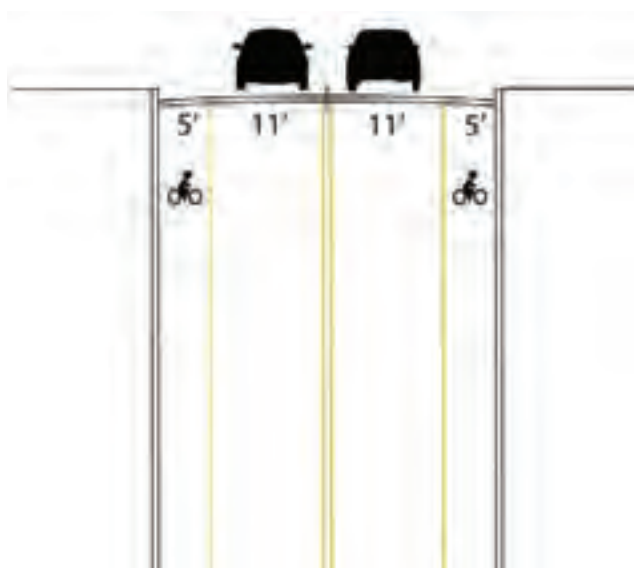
Option 2 - 32-feet of Broad Street with Two 11-foot Travel Lanes and Two 5-foot Bike Lanes
